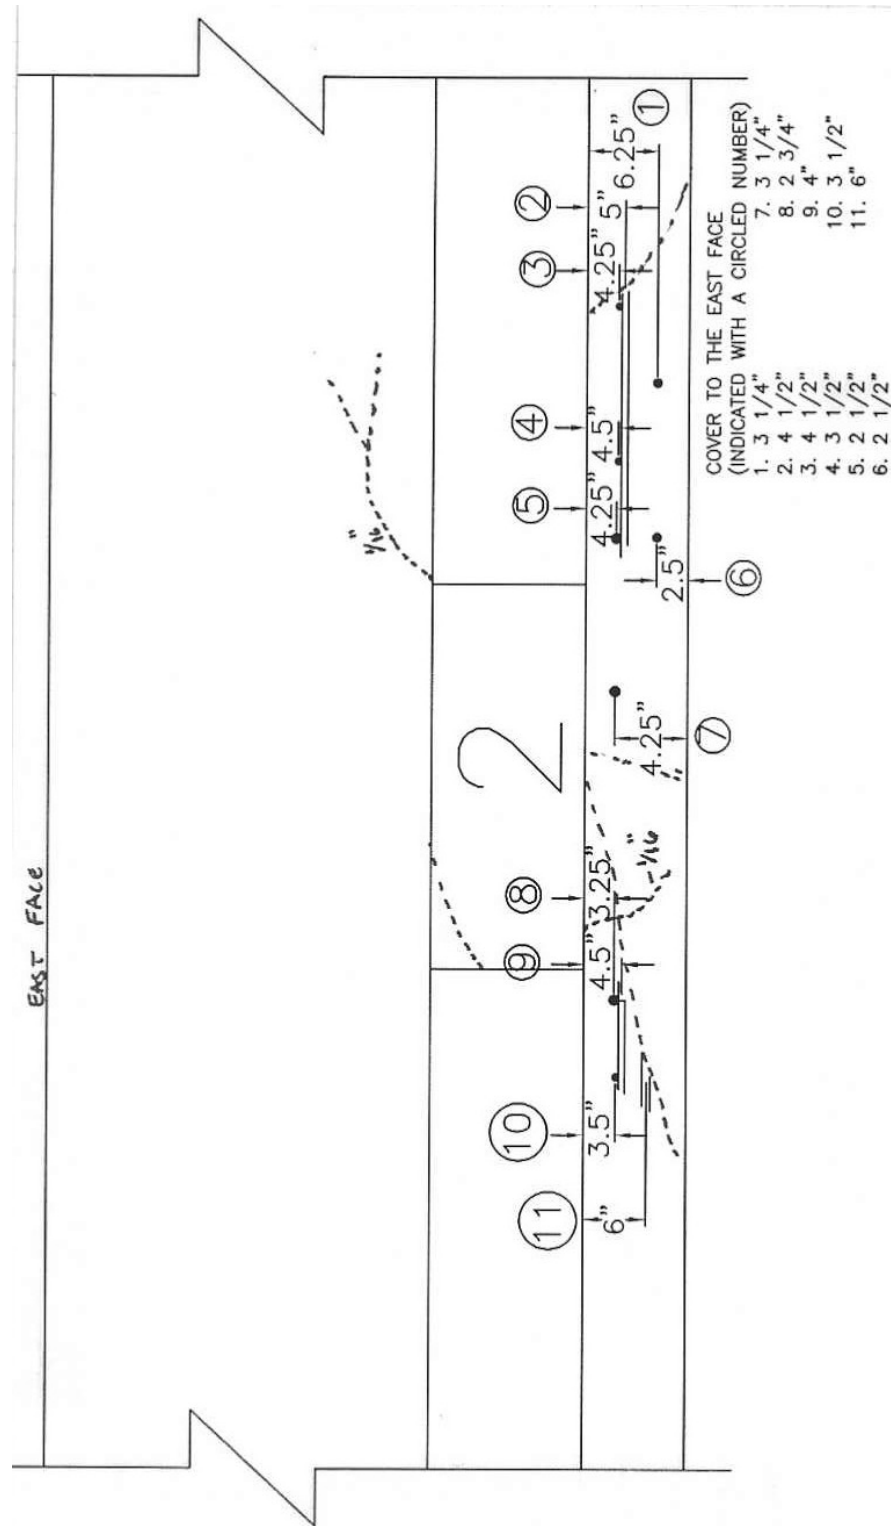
Concrete Damage – Back-side of Rail at Post No. 2, Test ACBR-1
